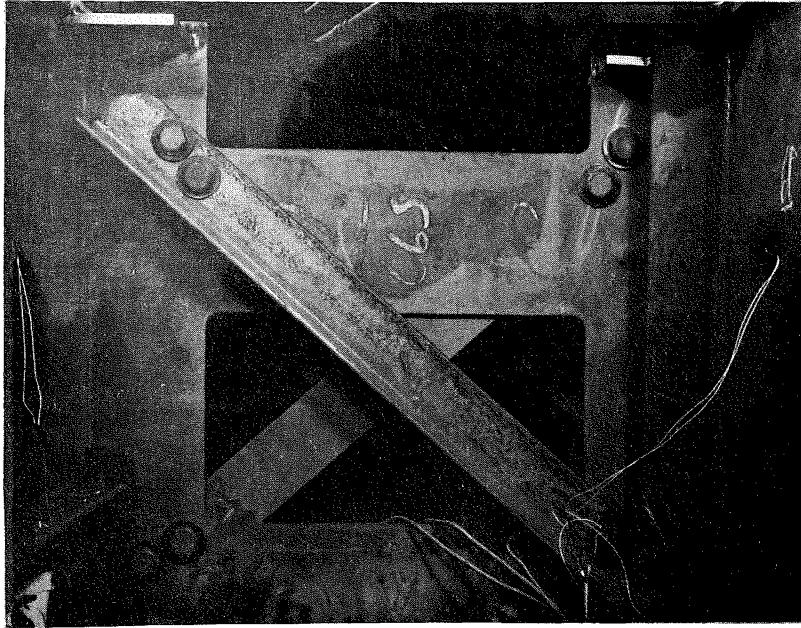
Girder 3 - Cross Bracing Used to Reinforce Interior Diaphragms
